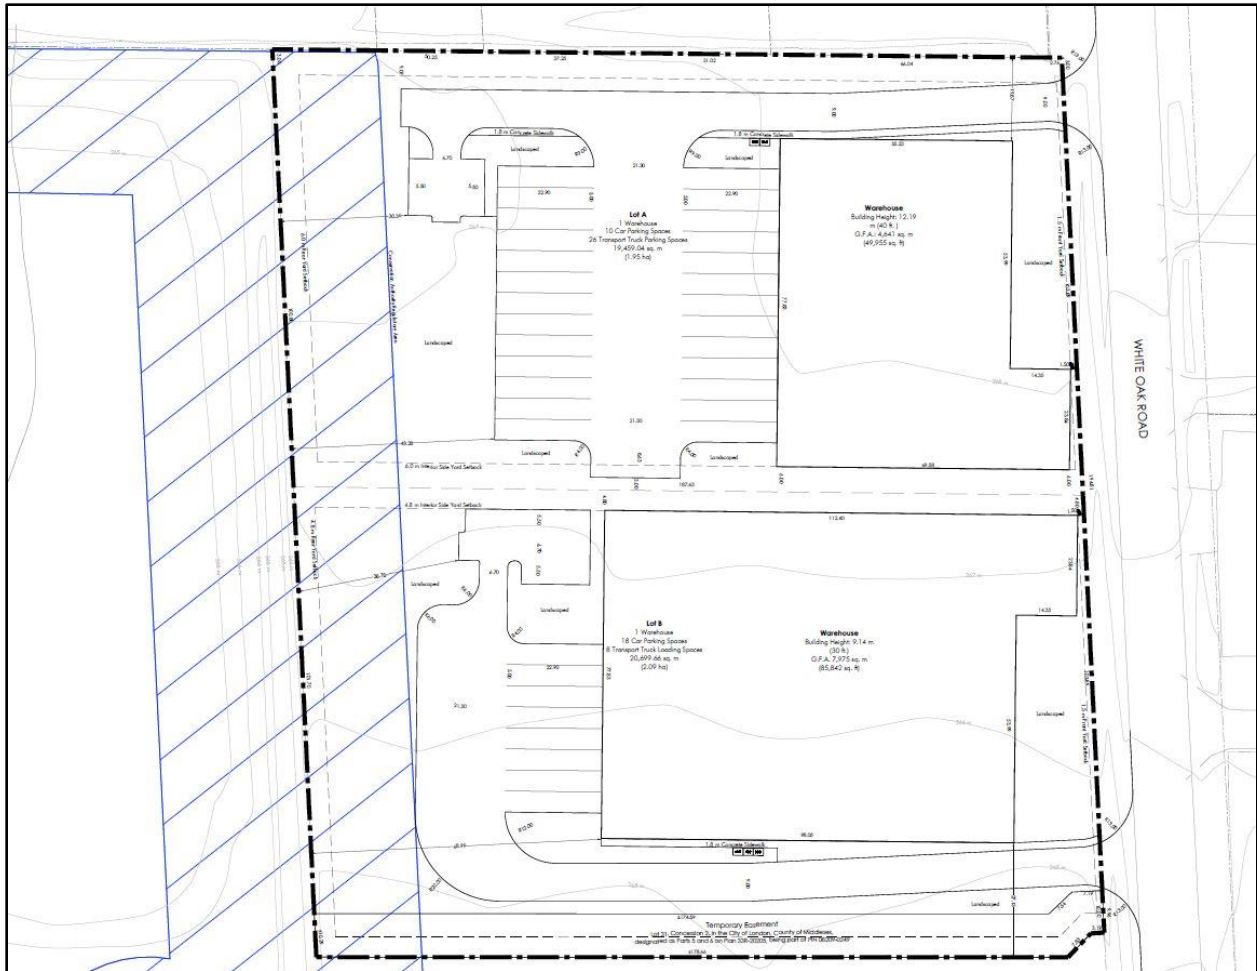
Conceptual Site Plan (Received June 20, 2023)
